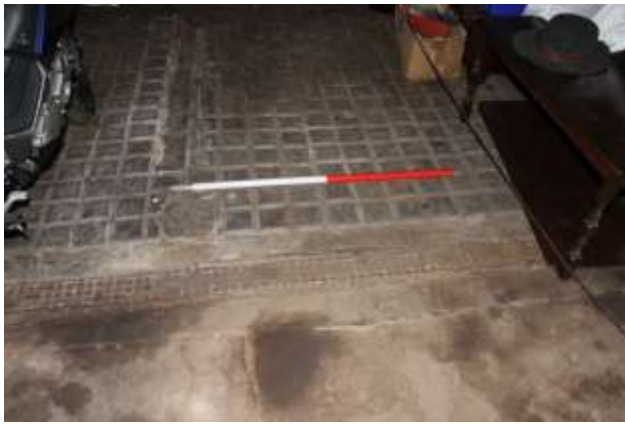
View of floor showing sandstone slabs, iron box drain and cement outline of stall divisions.
